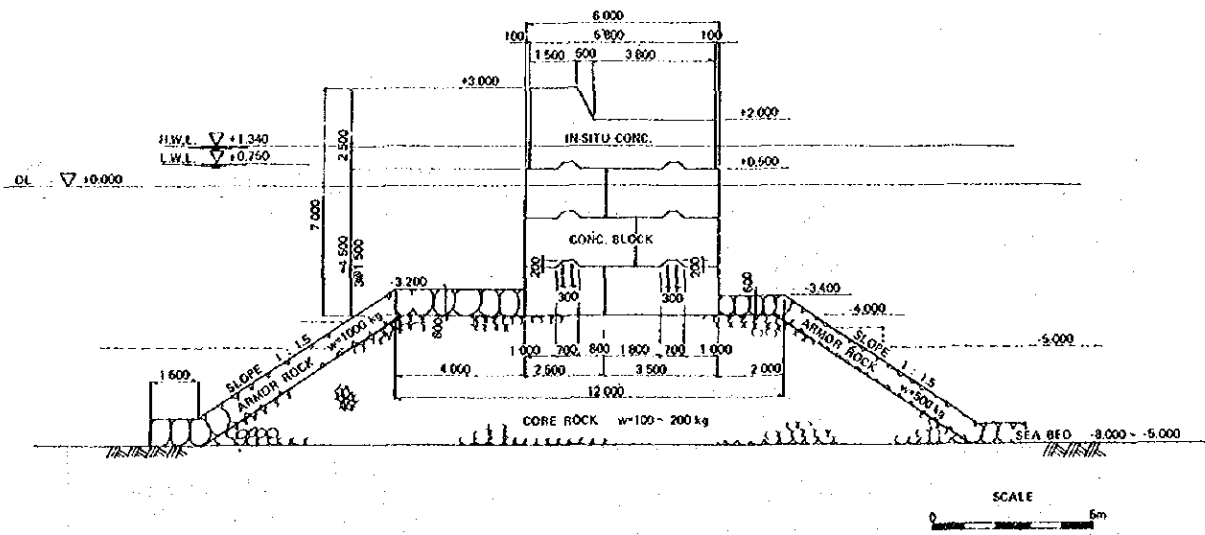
Cross Section of Breakwater (2) – Iloilo Port
